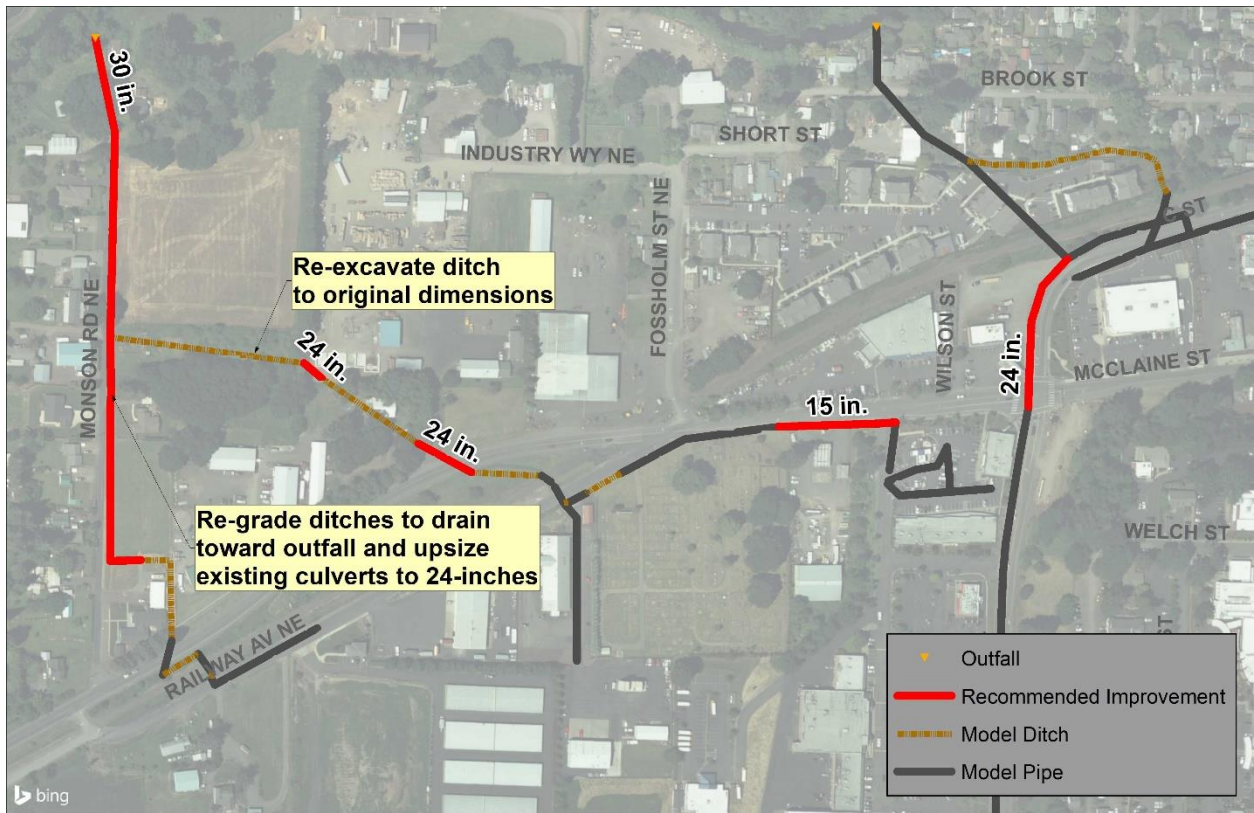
NORTH 1ST STREET ALTERNATIVES
